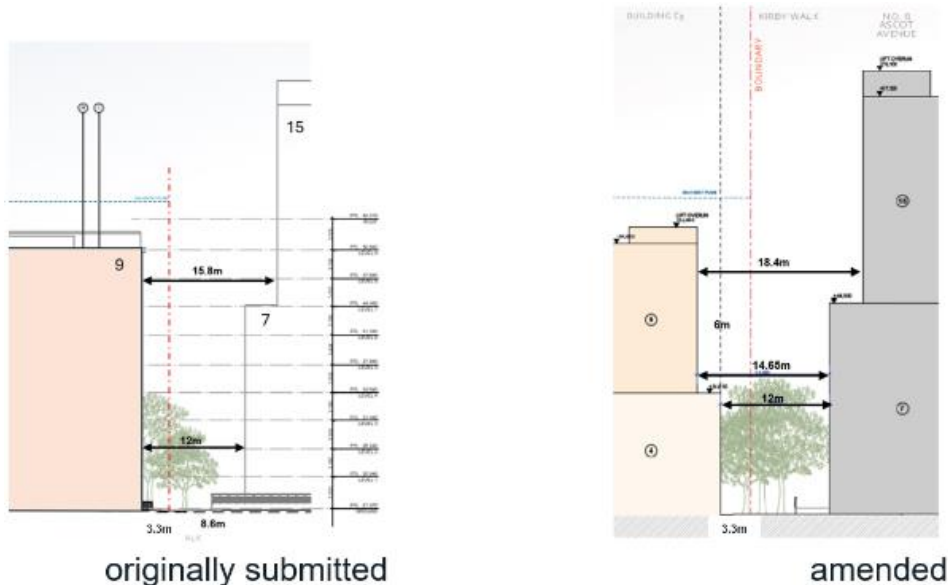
Originally submitted vs amended building separation between Building E3's northern frontage and 8 Ascot Avenue
